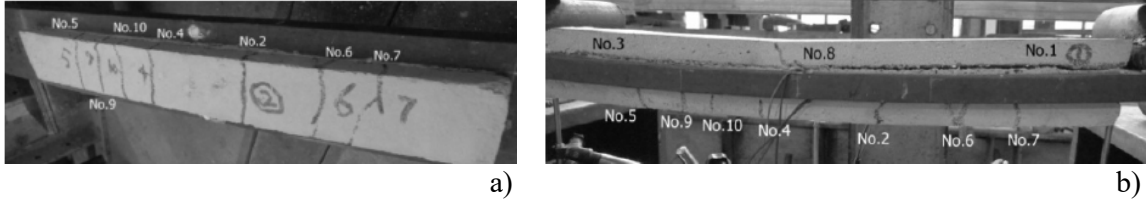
a) Cracking on tension side; b) SFRM damage at the end of the test [2]
